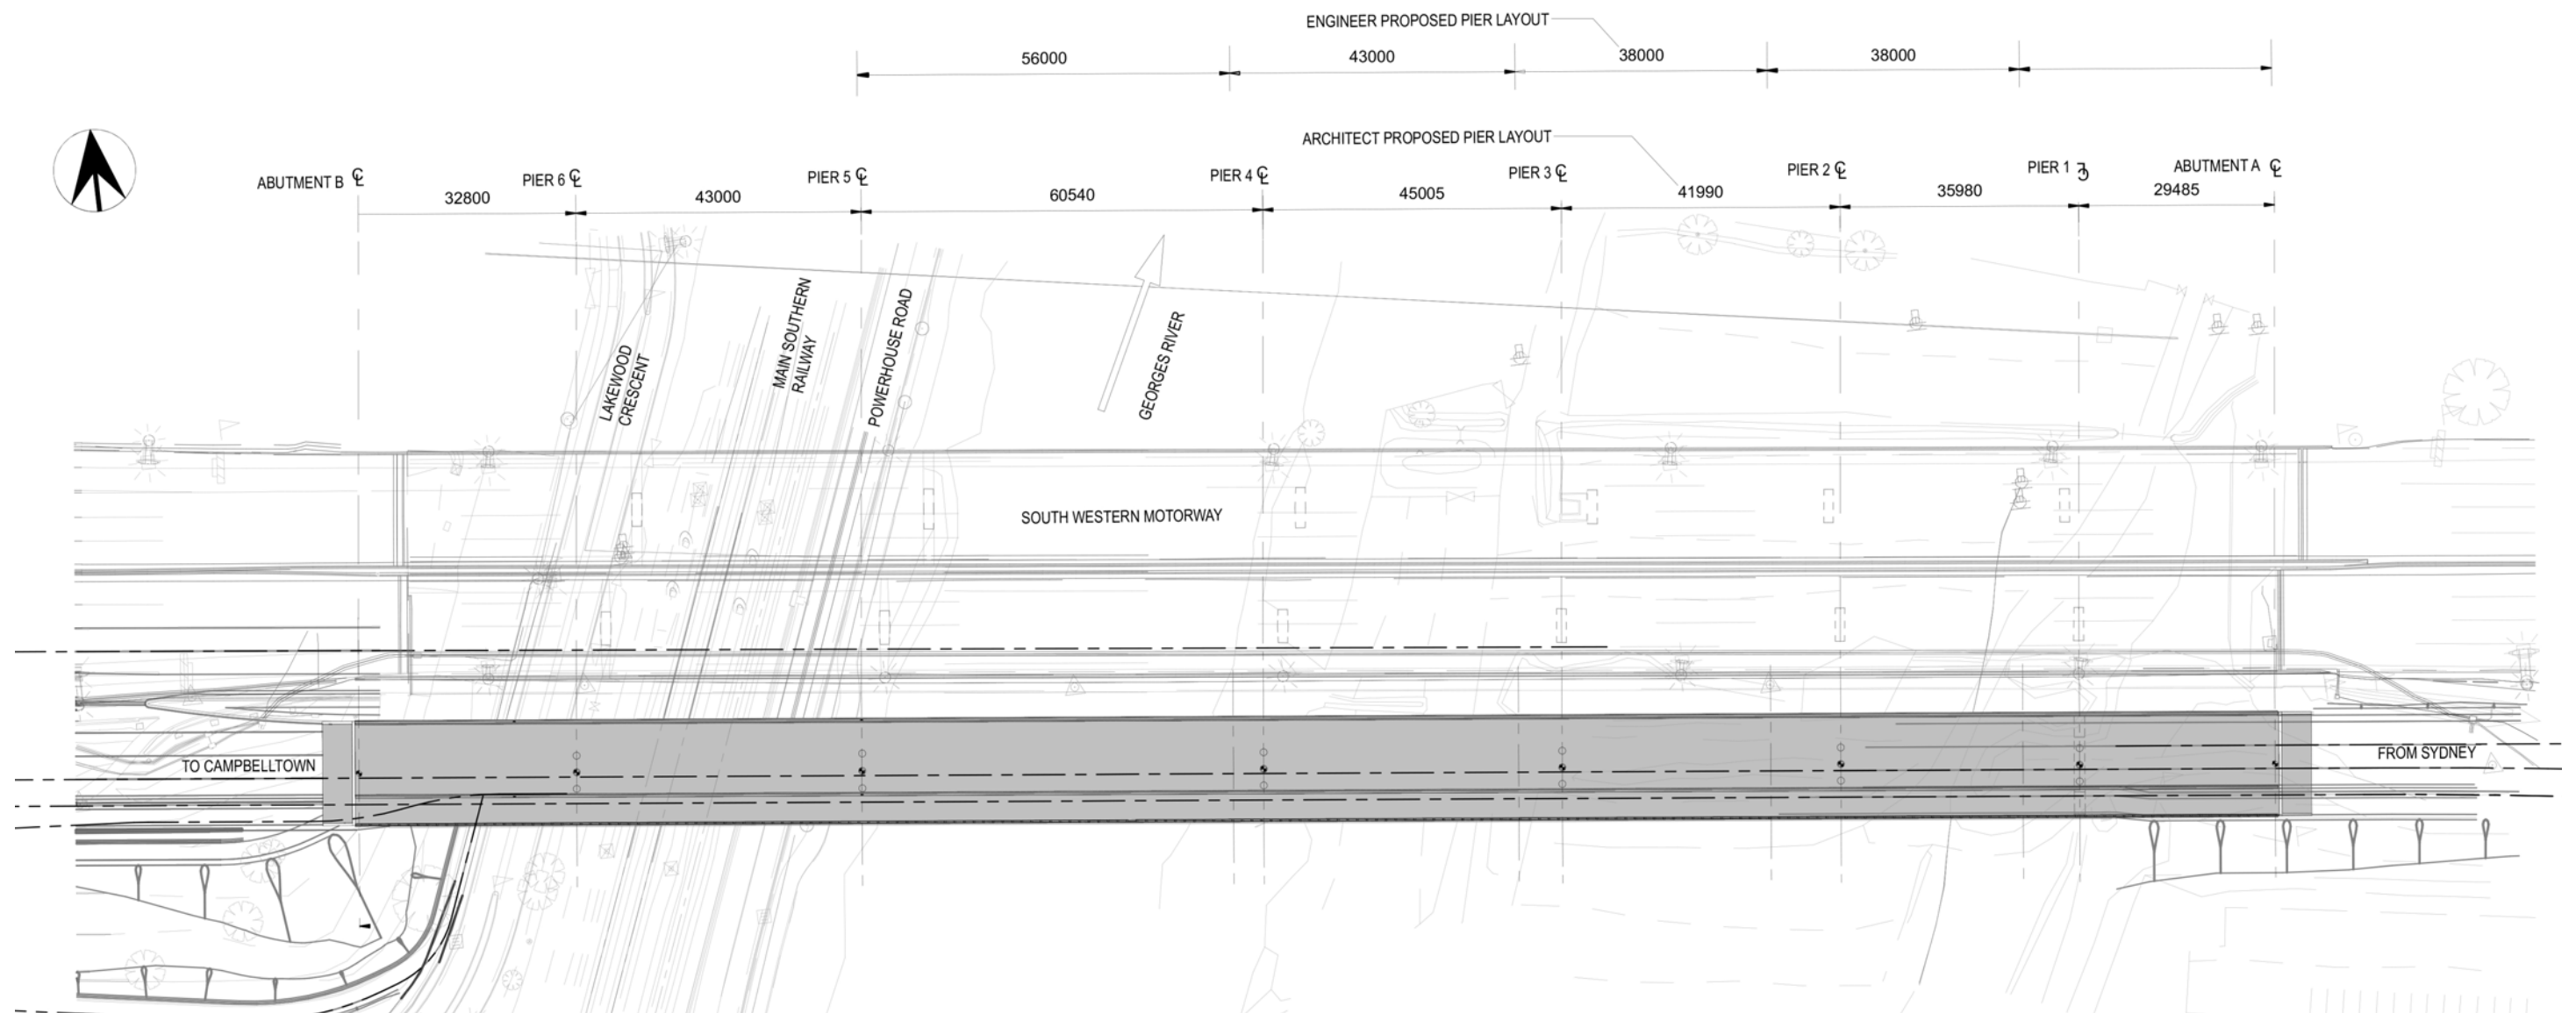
Plan of the proposed bridge over the Georges River. NTS
